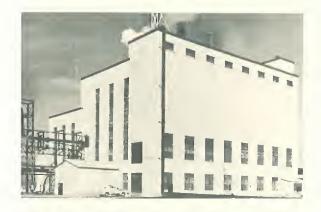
PHOTOS OF TYPICAL CAREYSTONE BUILDINGS
